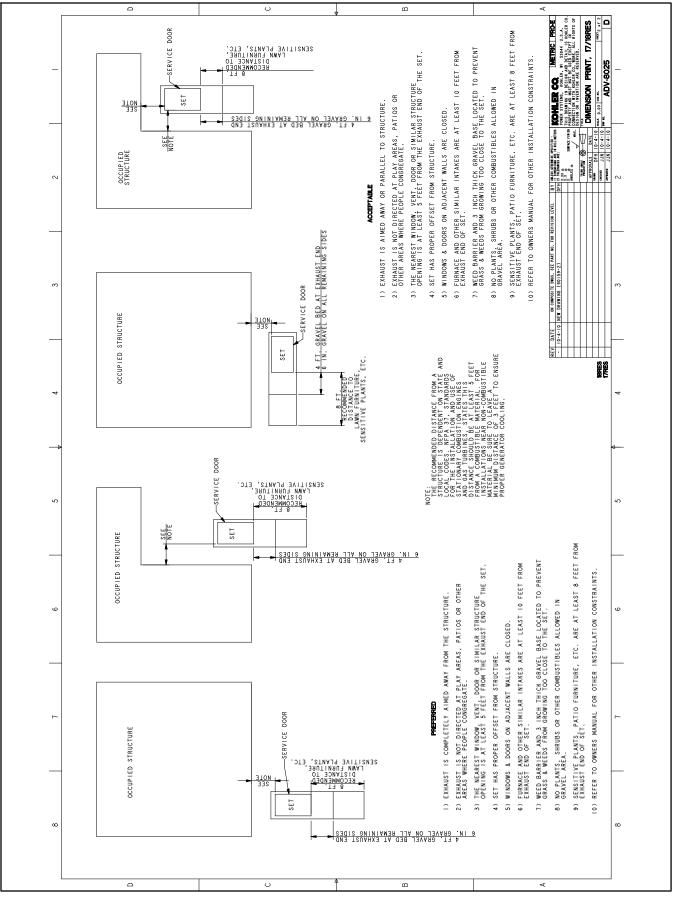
Generator Set Clearances,18RES, ADV-8025, Sheet 2
